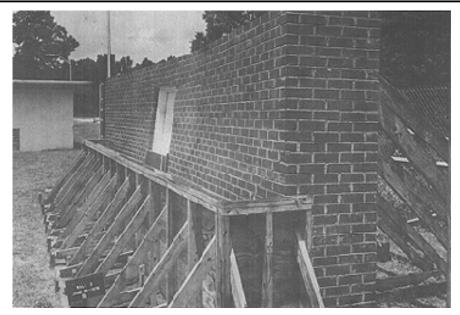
Brick Wall Showing Failure after Hydrostatic Loading Test (USACE 1988)
